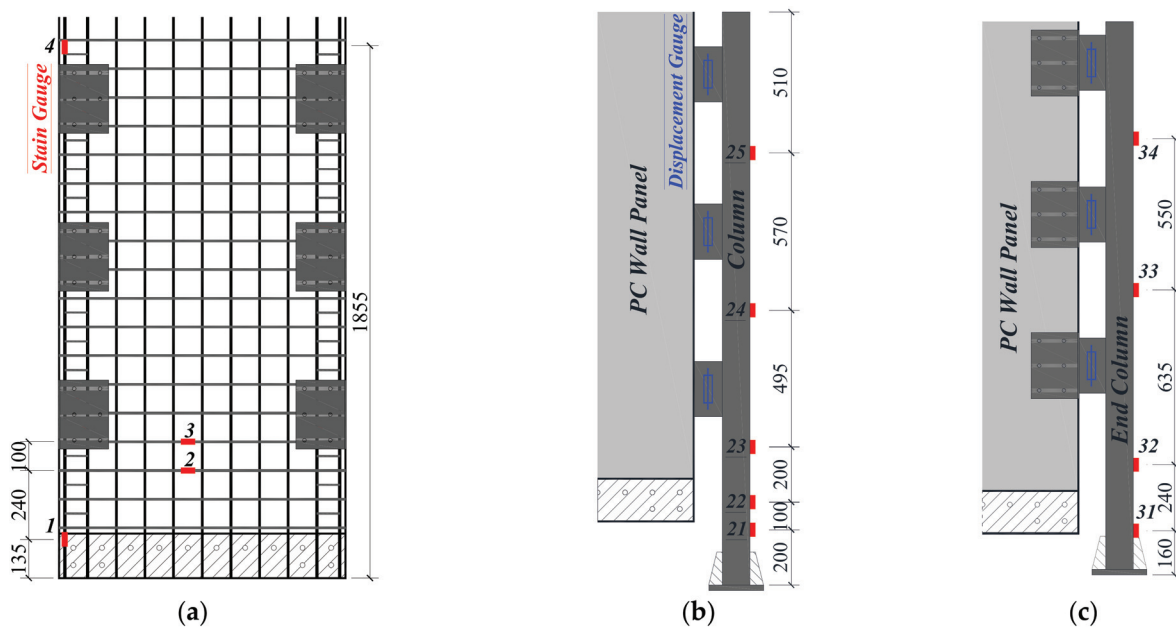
Instrumentation of wall. (a) Gauges mounted on wall; (b) Gauges mounted on W1-R end column; (c) Gauges mounted on W2-R end column.
